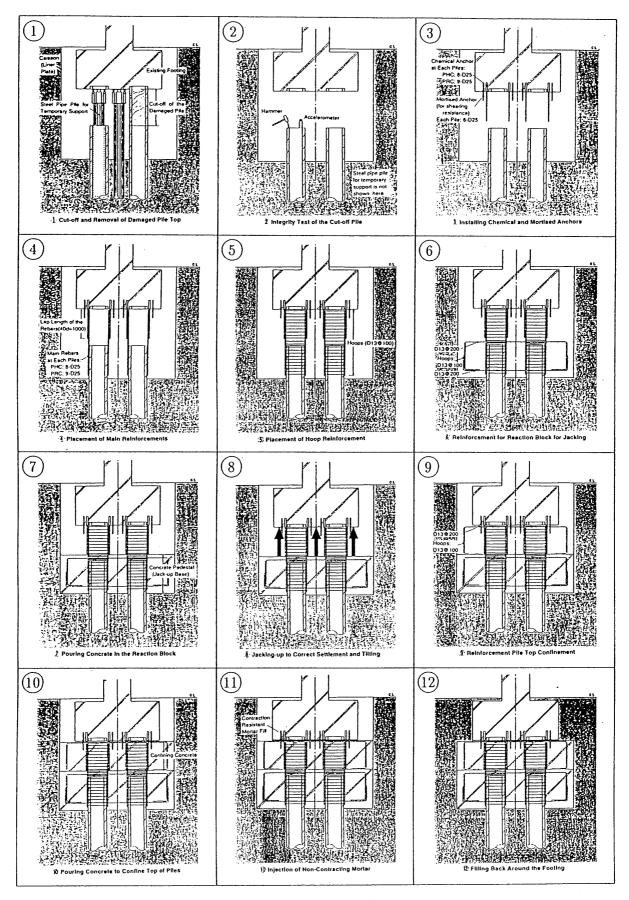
Diagram Illustrating Typical Underpinning and Repair Sequence for Restoration. (Note: To avoid obscurity, subsequent steps do not show steel pipe piles.)
